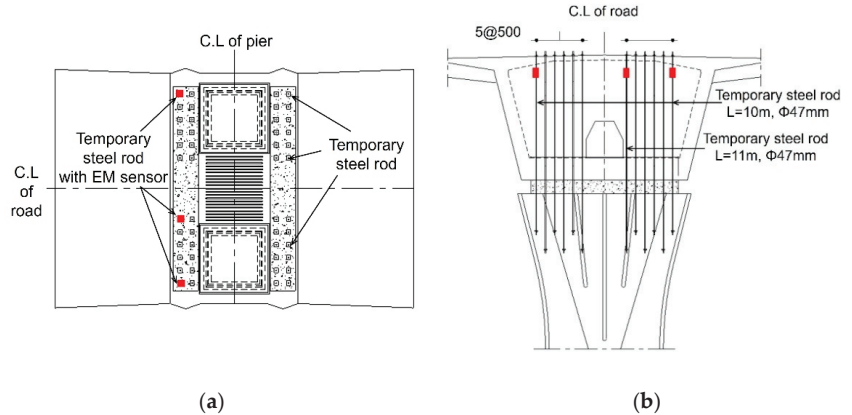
Layout of pier and pier table: (a) locations of EM sensors installed on pier table. (b) cross-section of pier and pier table.
